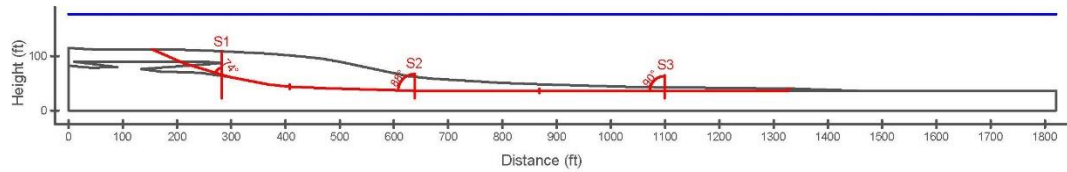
Sub-sectioning of the cross-section and failure plane for Nerlerk Embankment Slide 2
